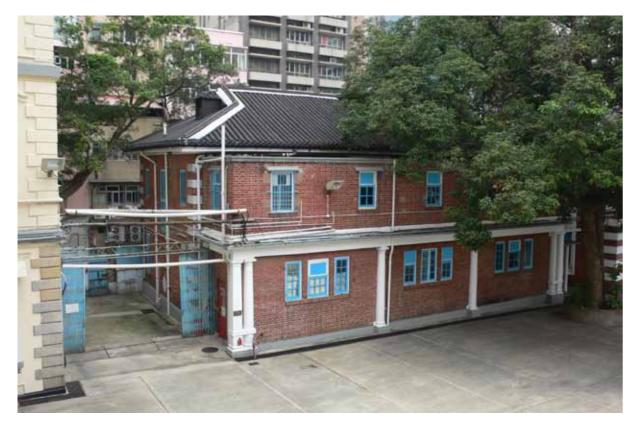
East (Parade Ground) elevation showing the infilled ground floor arcade and the poor quality first floor addition
